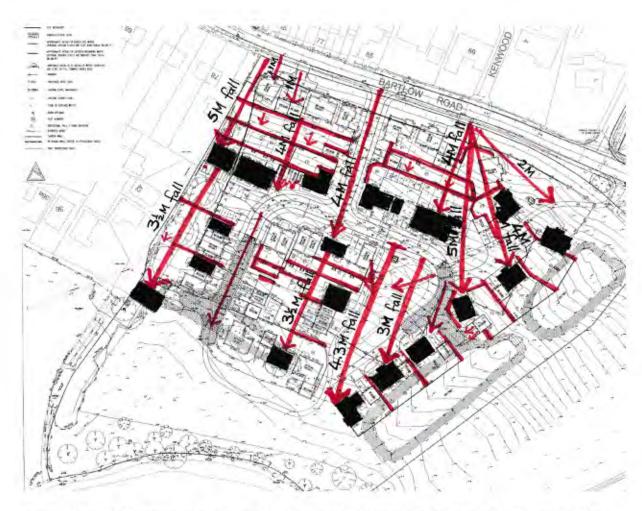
South Site terracing, levels and slopes down the proposed development. The Levels Plan used as a base shows the three unauthorised mounds within the proposed scheme.
